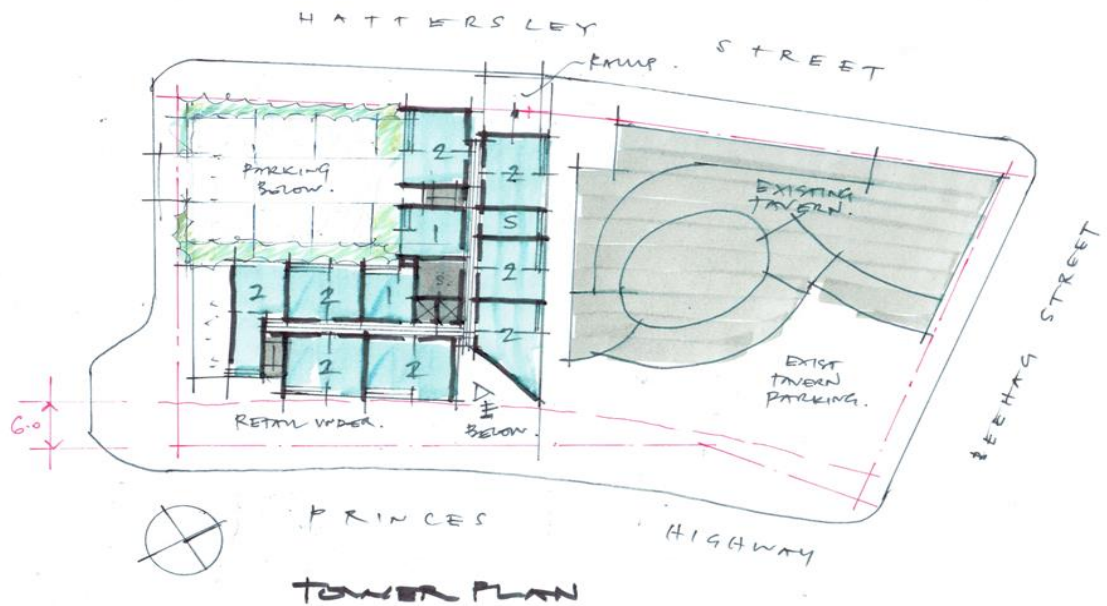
Indicative sketch of proposed serviced apartment development (floor layout, first floor)
